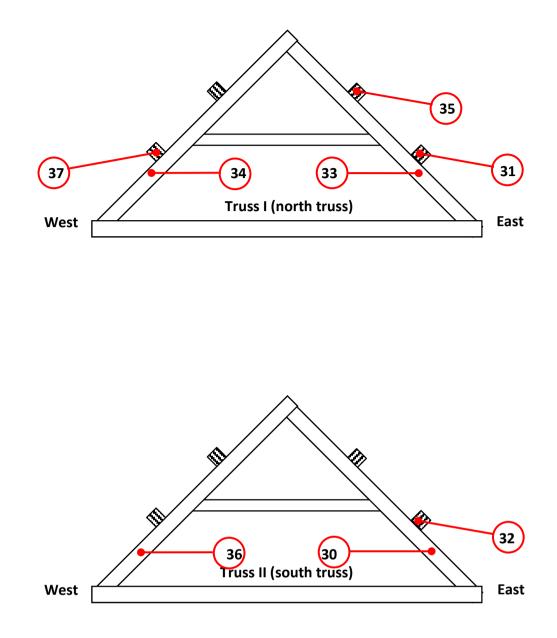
Sections through the roof trusses of building 2 to locate sampled timbers (see Table 1)
